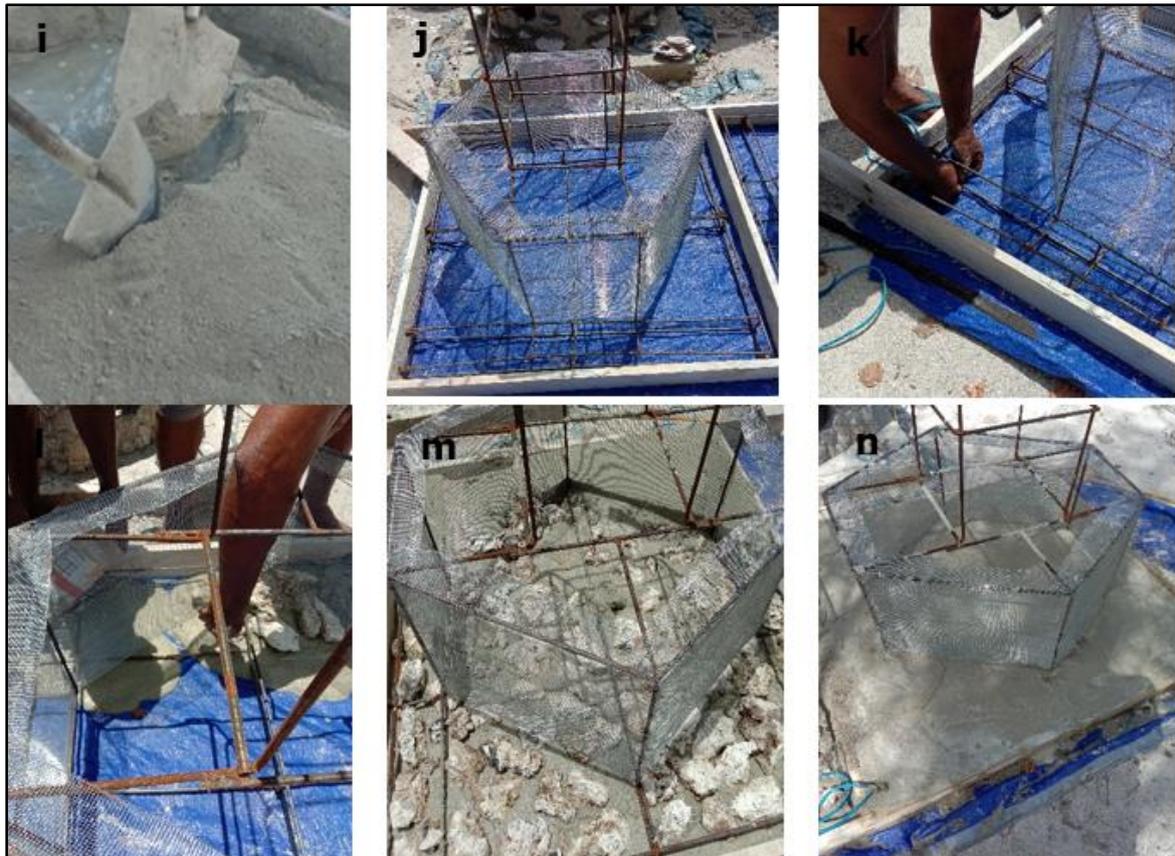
Structure stages: i. sand; j. frame instalation; k. attaching the rope to the weight frame; l. arrangement of stones on the ballast frame; m. arranged stones; n. cement mixture on the ballast frame.
